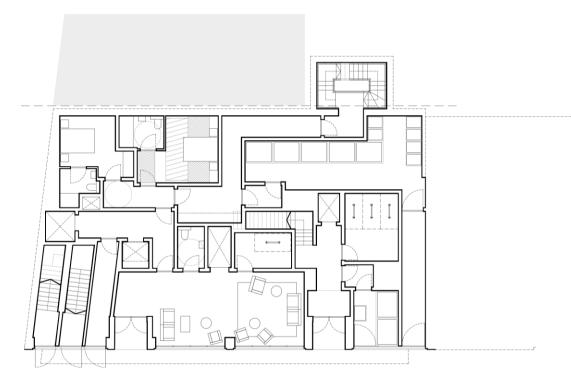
Proposed ground floor plan showing the commercial space, hotel ancillaries.
